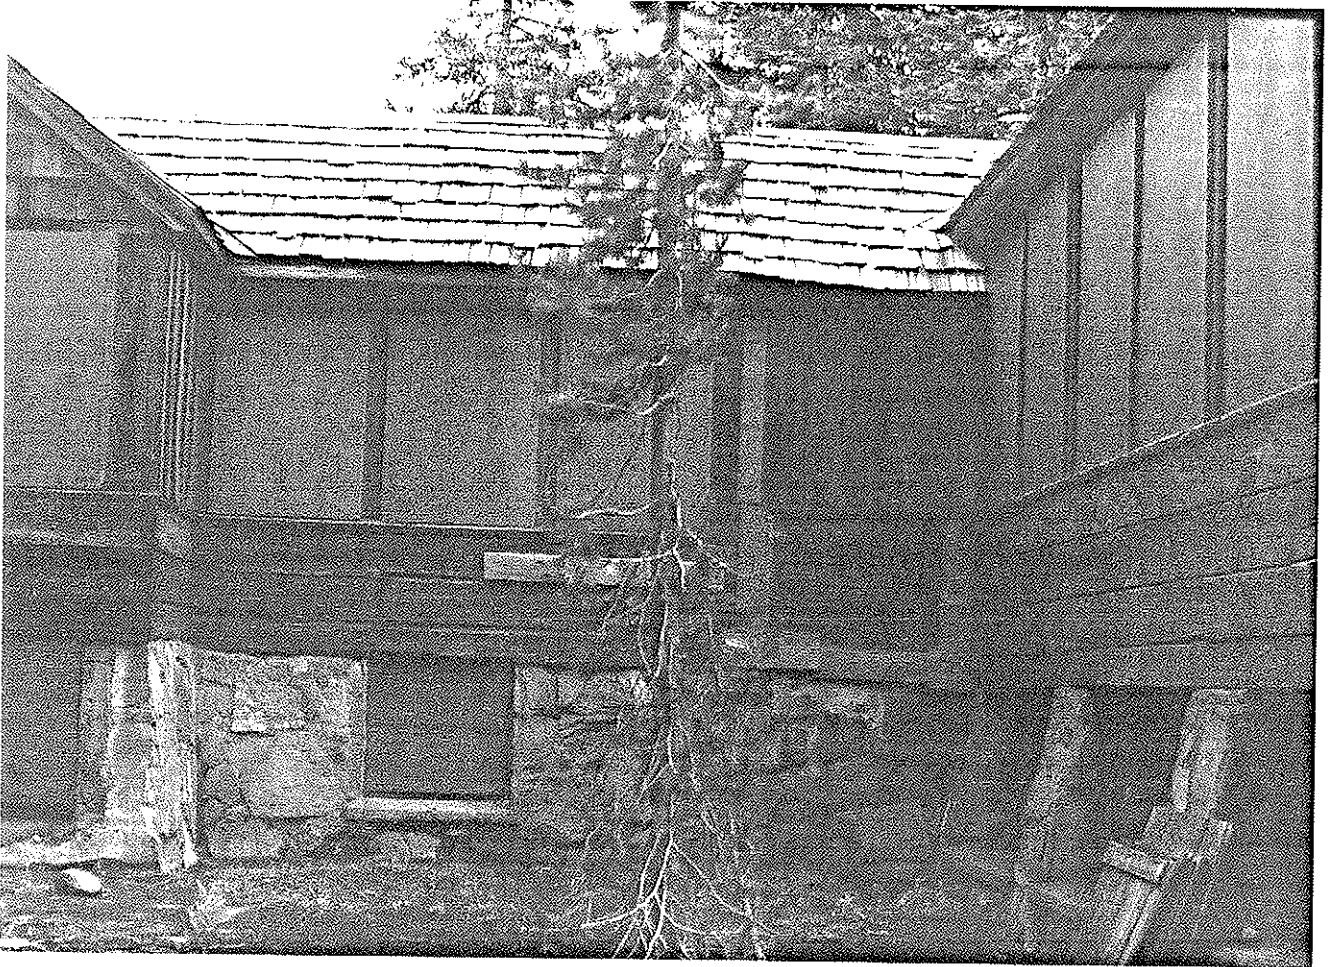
Santiam Lodge. West Elevation, center, showing hallway which connects the back wing to the main structure. October 1988.
